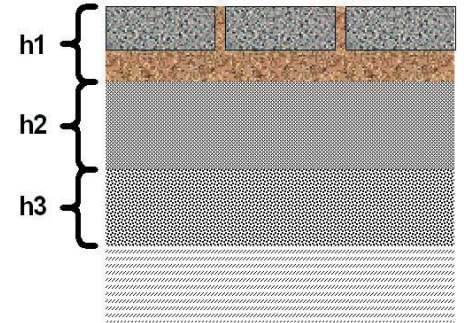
schematisation for the calculation of the Structural Number in concrete block pavement
